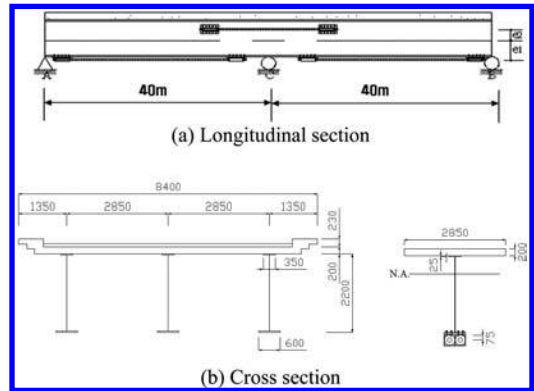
A plate girder bridge strengthened with external tendons (unit: mm).
